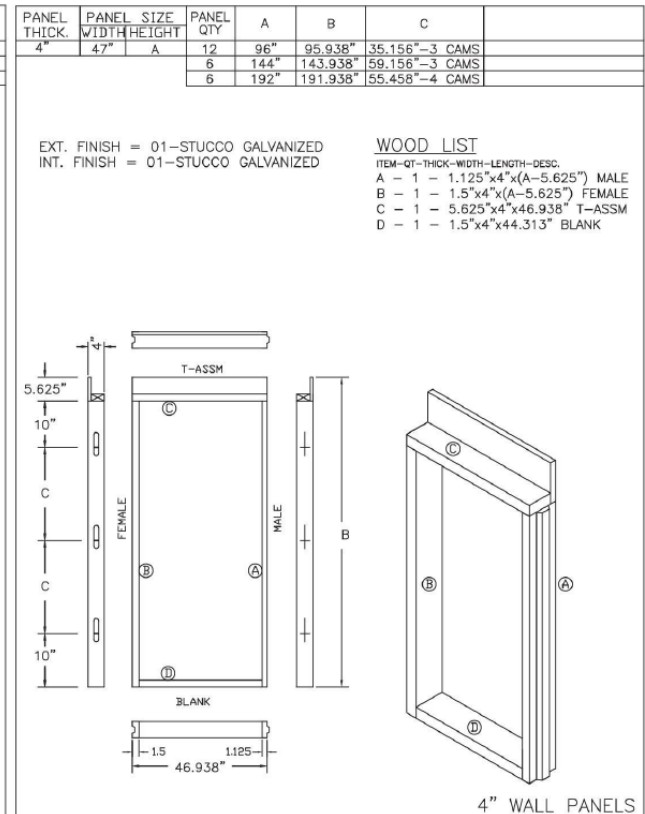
WOOD RAIL WALL PANELS (4-INCH SHOWN)
